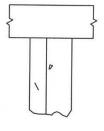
Typical Abrasion Damage to Concrete Piles
